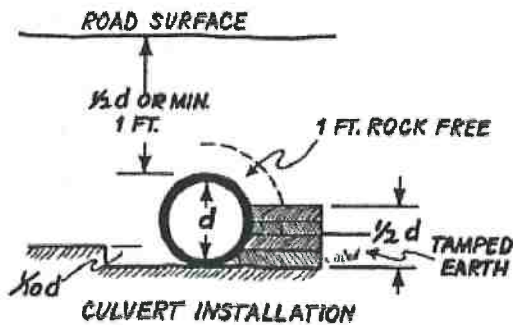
The elements of a properly installed ditch relief culvert. The culvert is angled at about 30 degrees to the road alignment to help capture flow and prevent culvert plugging or erosion of the inlet area. It is set at the base of the fill (ideally) or with a grade slightly steeper than the grade of the contributing ditch (but never with a grade less than 2 percent) (USDA-SCS, 1983). At a minimum, the grade of the ditch relief culvert should be sufficient to prevent sediment accumulation at the inlet or deposition within the culvert itself (it should be self-cleaning) (USDA-SCS, 1983).
